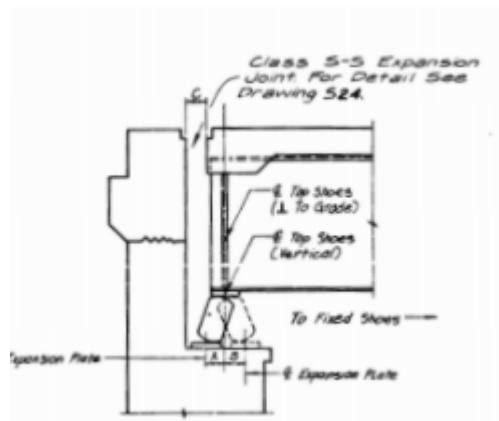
Abutment Detail of the Bridge (NBI 21985) (1984)
